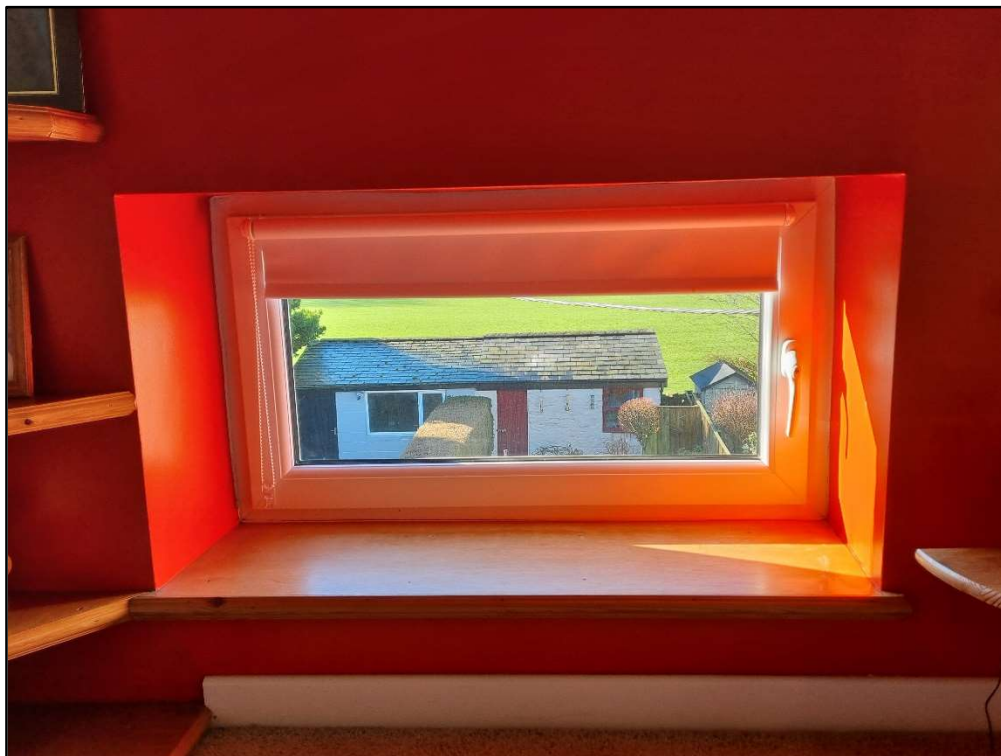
The first floor and attic windows on the rear elevation. The proposed alteration is to replace the two windows with hardwood framed side hung casements and slimline double glazing (source – Jamie Skuse)
